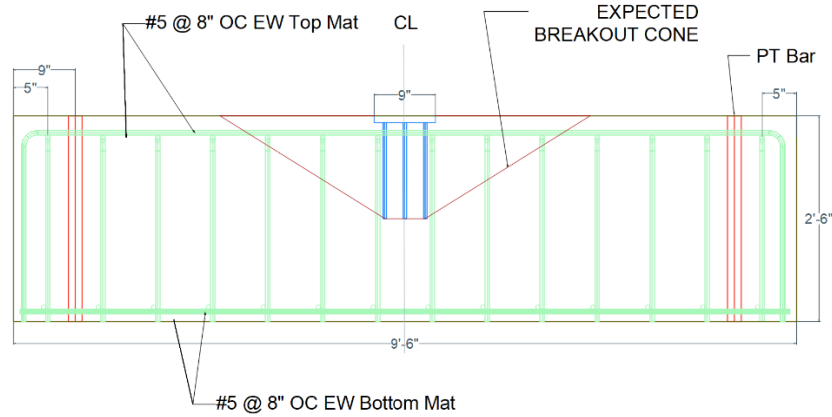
Cross-section of concrete block for 3x3 DWA 5/8 specimen
